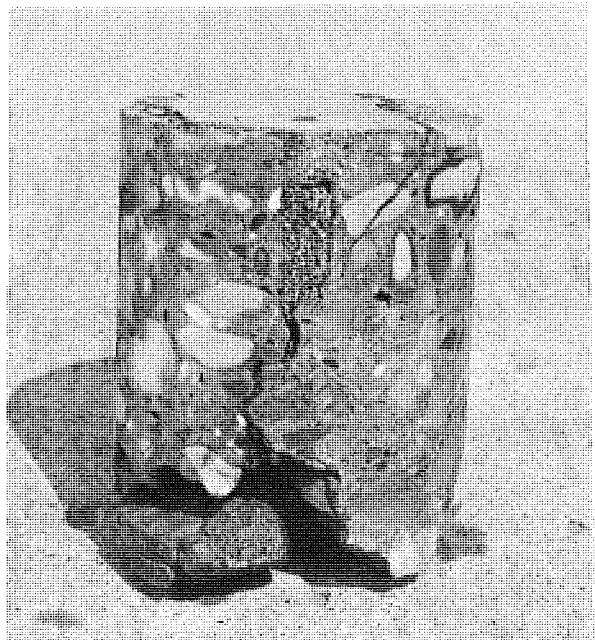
Core from area where the concrete had failed in tension. The epoxy had not entered the plane-of-weakness crack.
